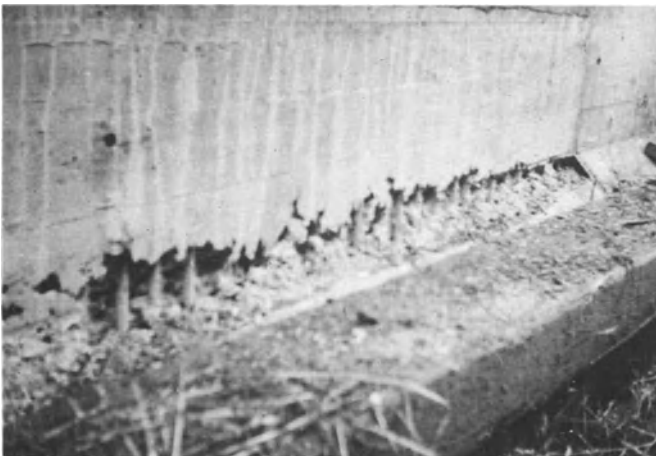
The concrete was not fluid or vibrated enough to reach the base of the formwork. Even so, fillets of the type shown at the base of a wall are always difficult to shutter and concrete satisfactorily, and the designer should consider possible alternatives that make the contractor's work easier
